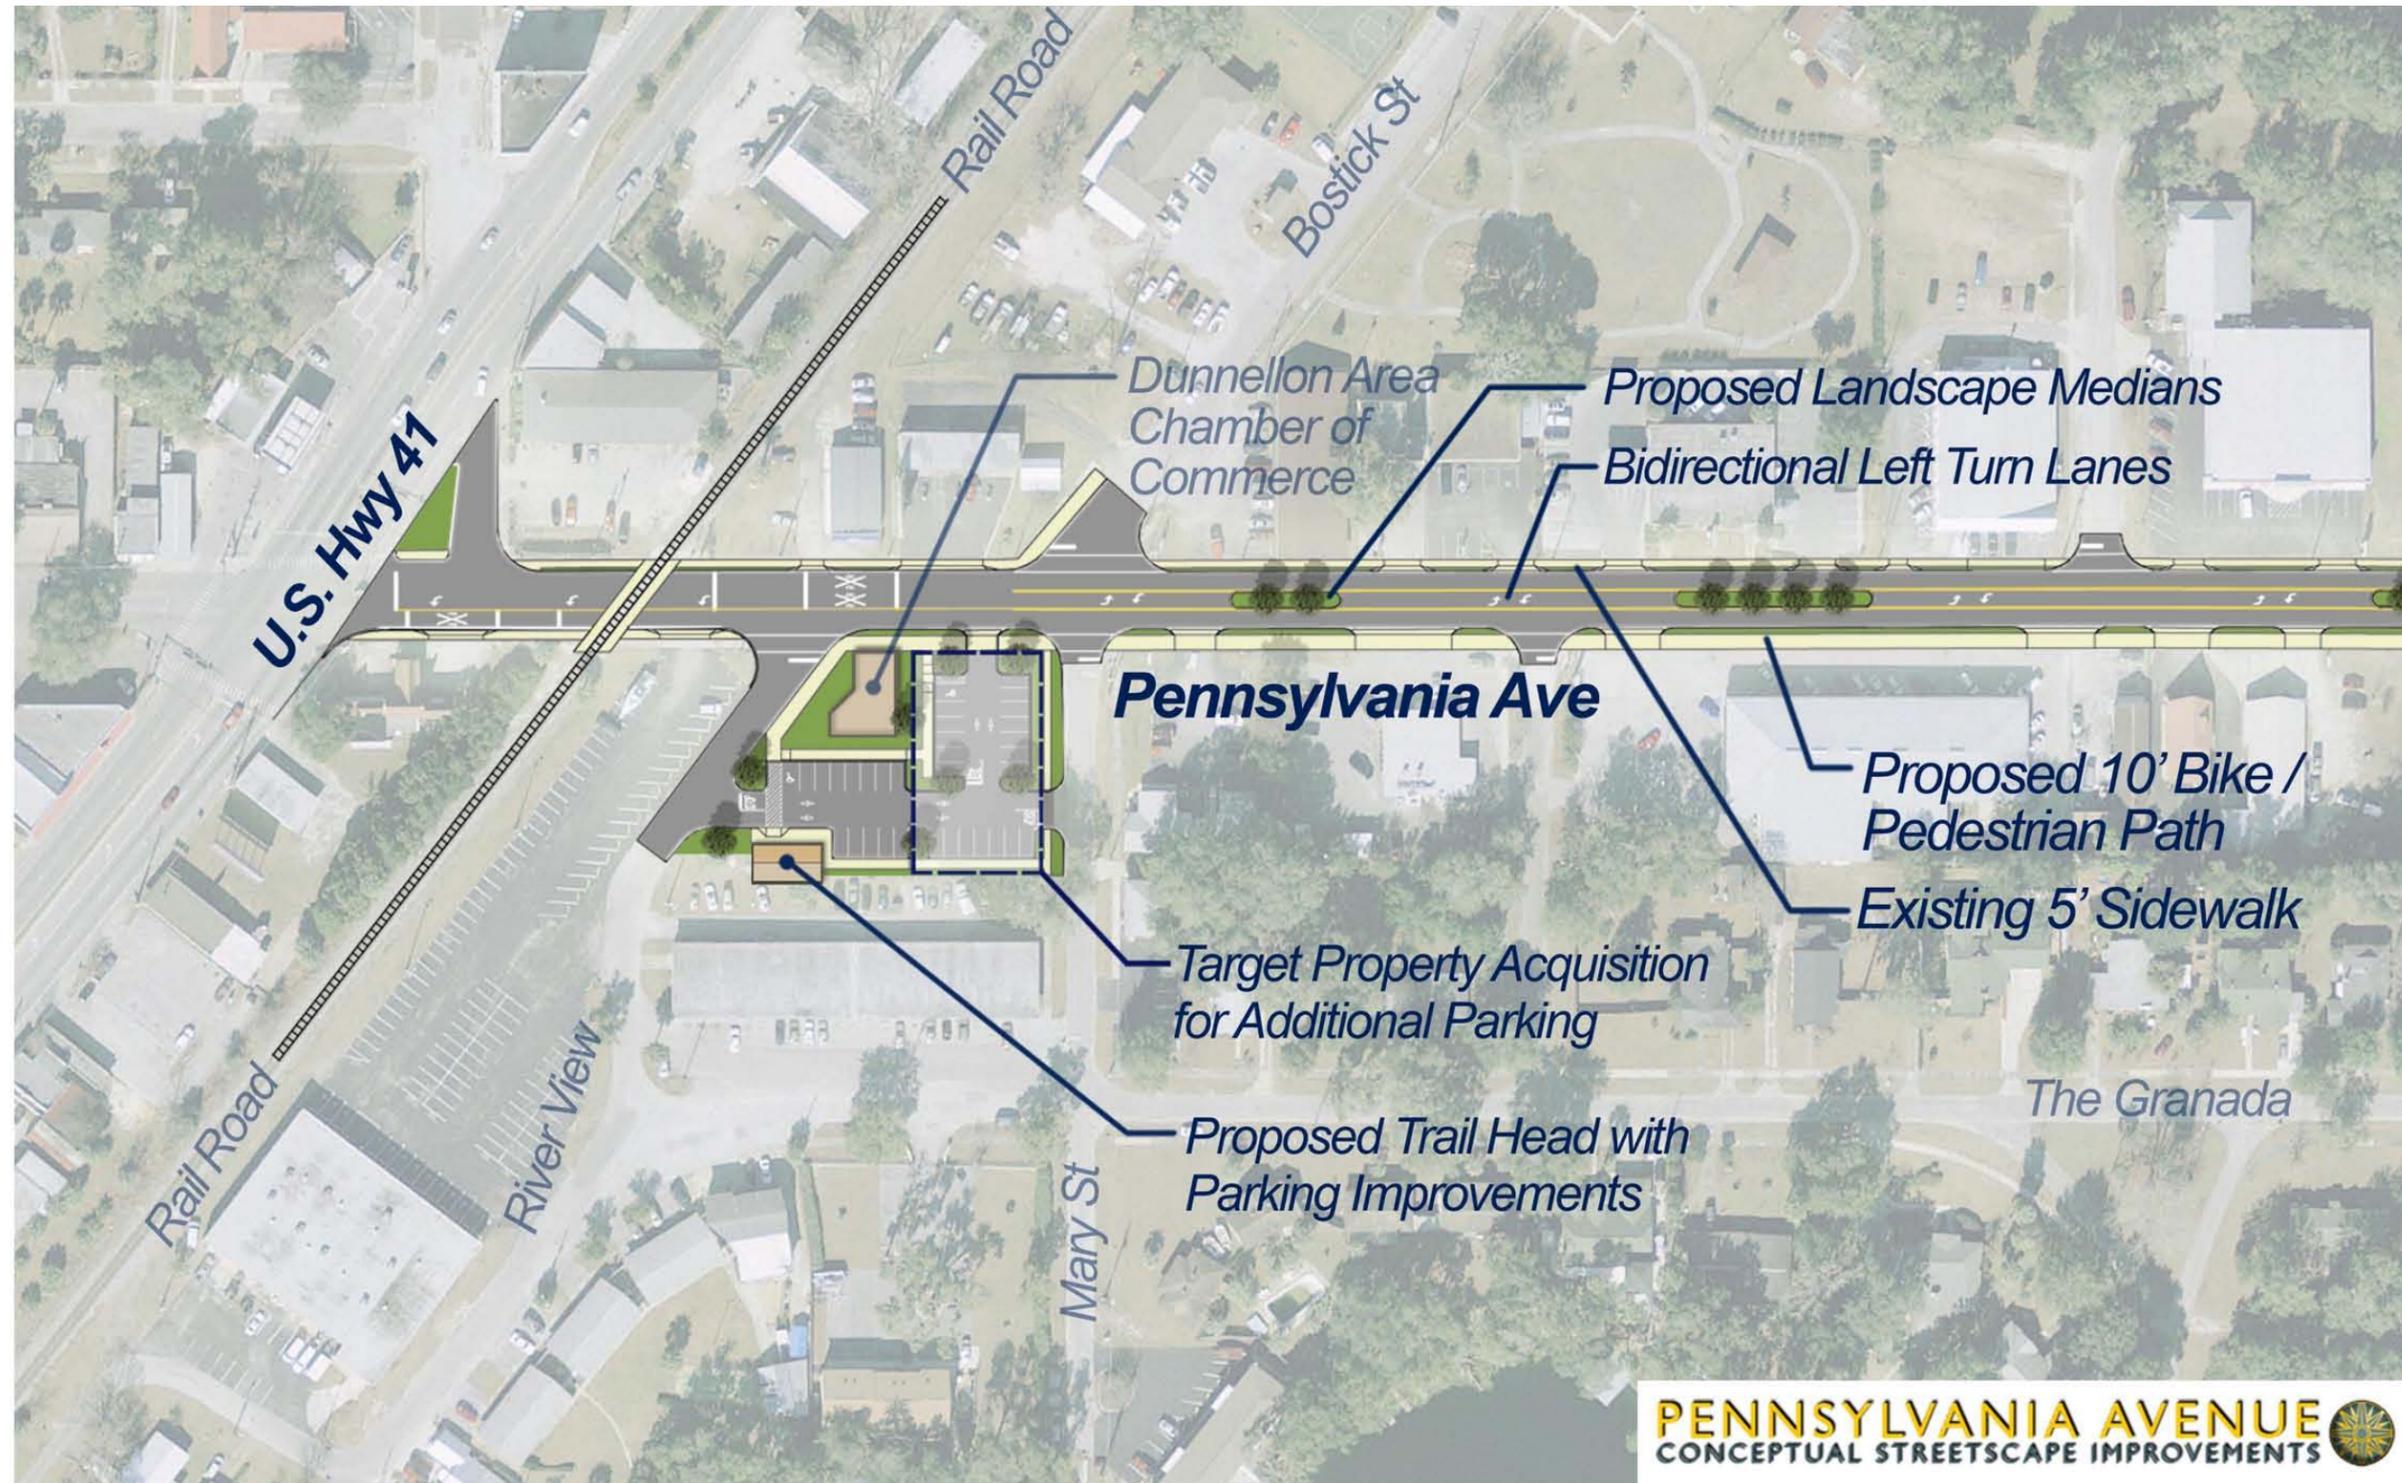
A: Pennsylvania Avenue Streetscape Plan View
